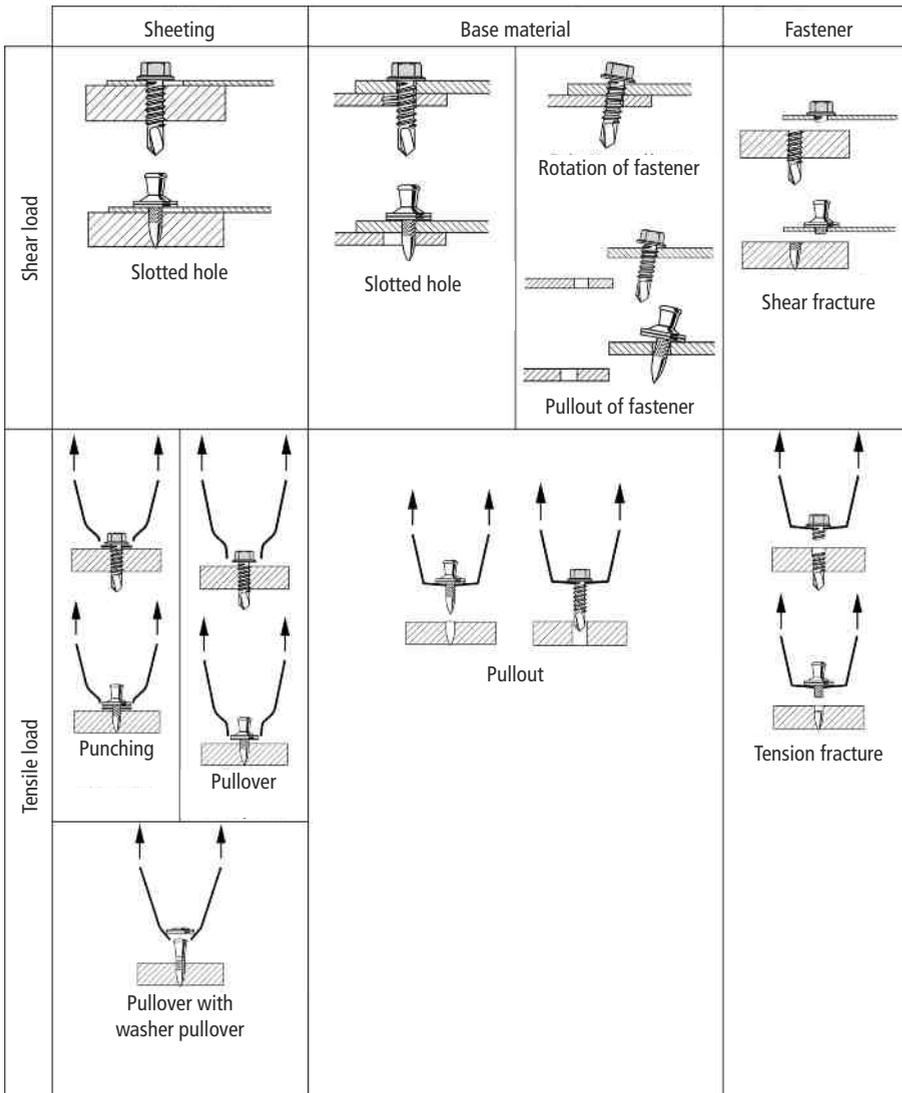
Failure modes for fastenings made with powder-actuated fasteners or fastening screws
